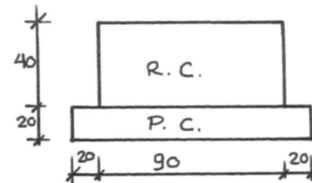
Cross Sectional Dimensions of The Strip Foundations.
